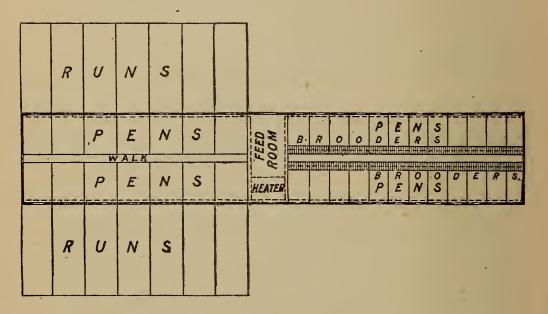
Plan of a double brooder, showing arrangement of heating pipes.
